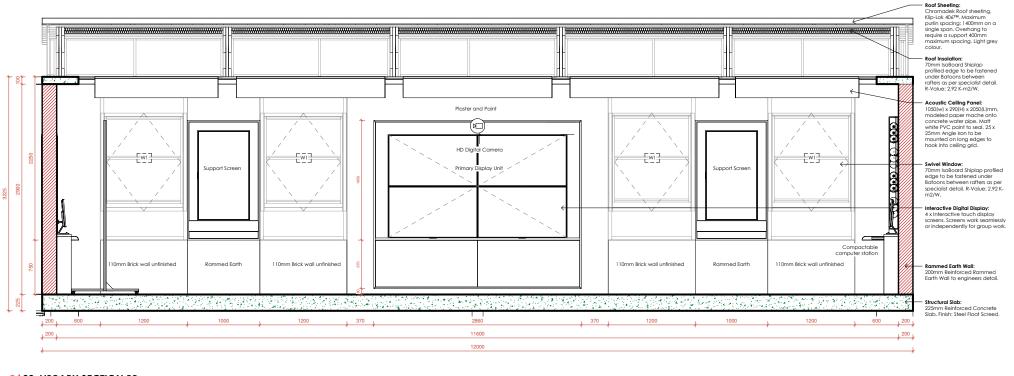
Library section 1: section detail interior, (Author, 2021)
